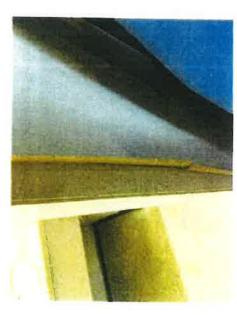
Knights Inn Wallpaper with Adhesive (HA-05)
